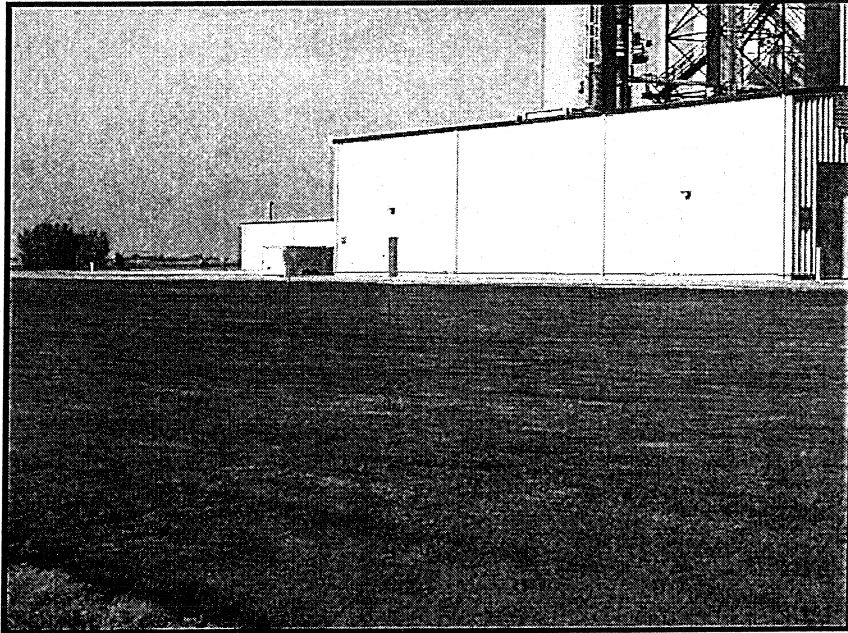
Proposed area for Biofuel Facility – at Lincolnway Energy, LLC. View is to the northeast showing paved roads
